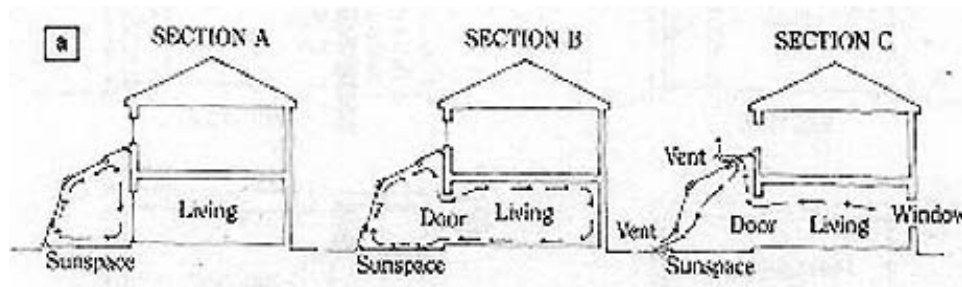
One-story sunspaces: winter, sunspace cut off from the house (Section A); winter, sunspace helps the lower story via open doors (Section B); summer, sunspace helps cool the lower story by pulling in air from the north windows (Section C).
